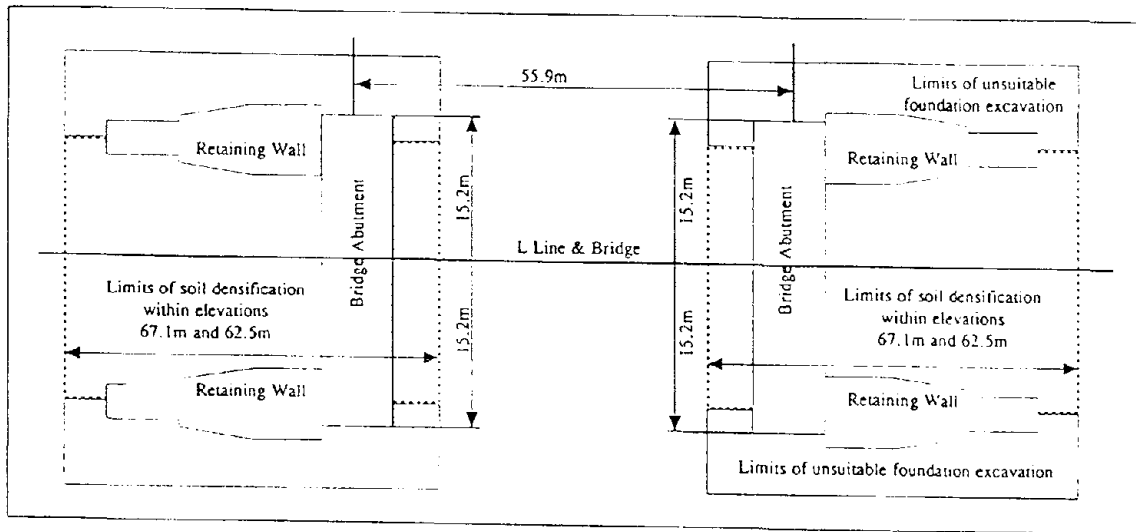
Vibro-replacement provided at each bridge end for Andresen Road.
